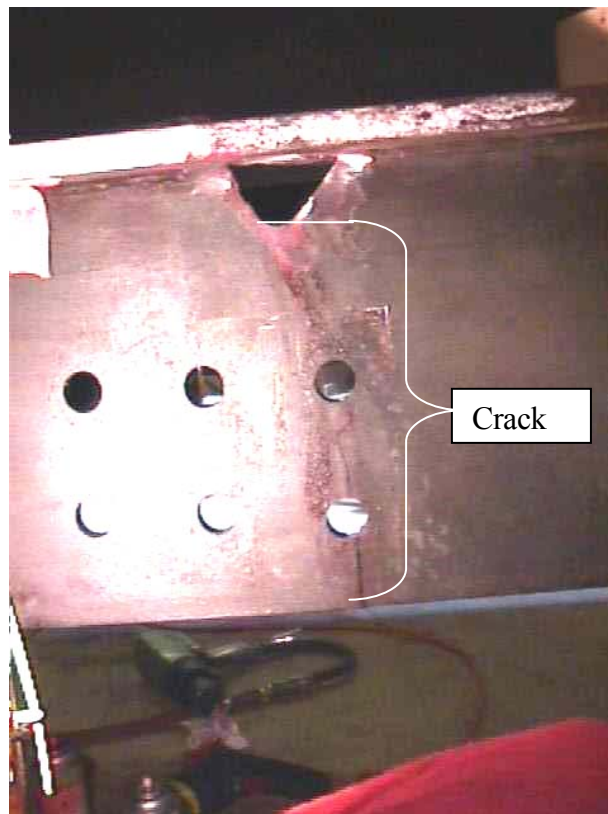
Detail of crack in added web with weld access hole already prepared.
